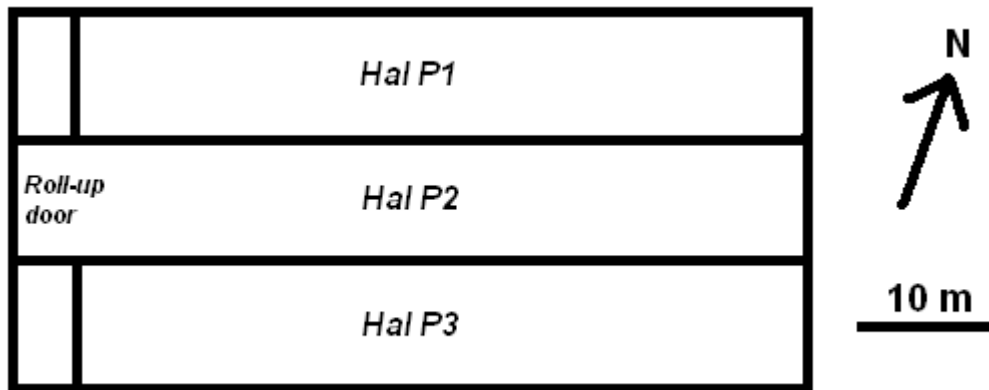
Floor plan (approximately to scale) of storage areas inside Building P.
